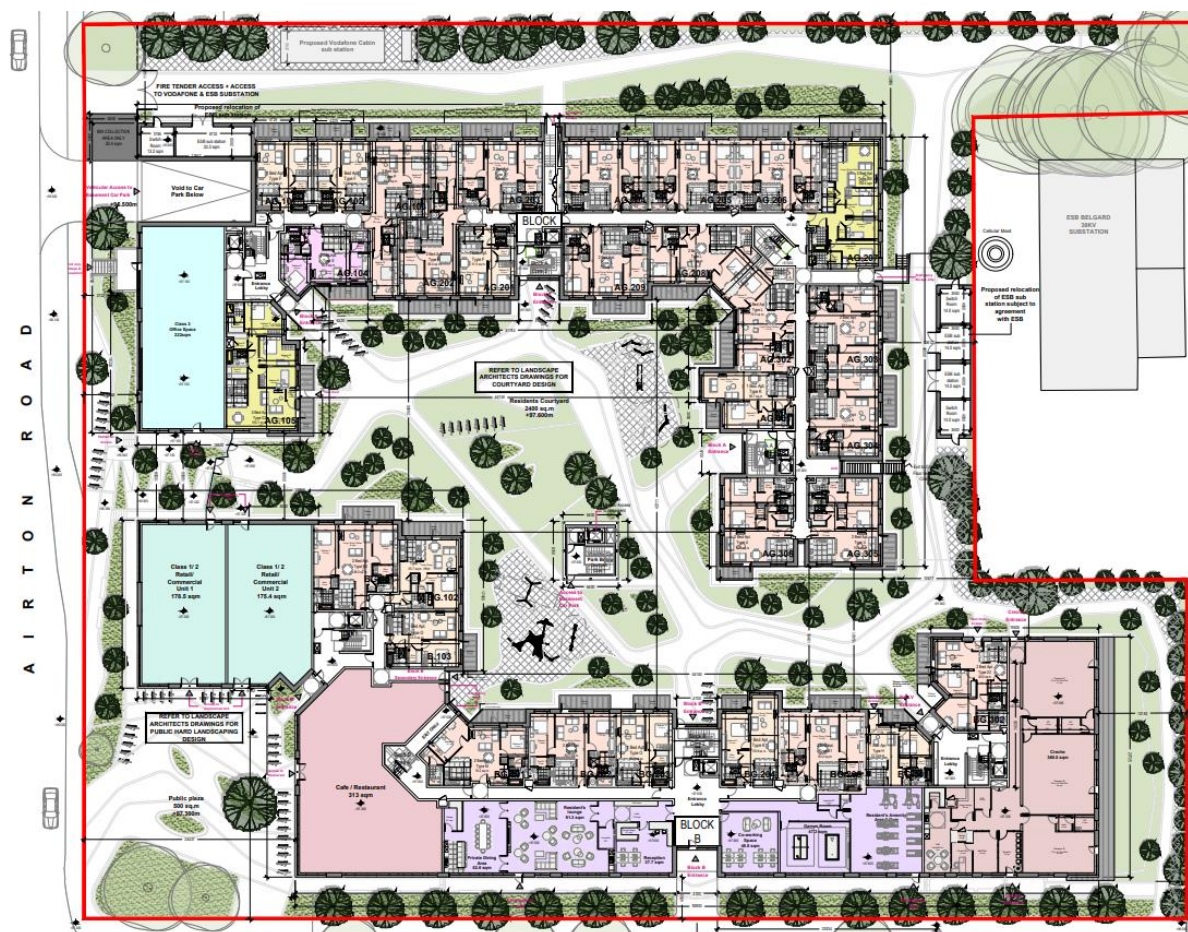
Ground floor layout plan approved under ABP Ref. ABP-305763-19
